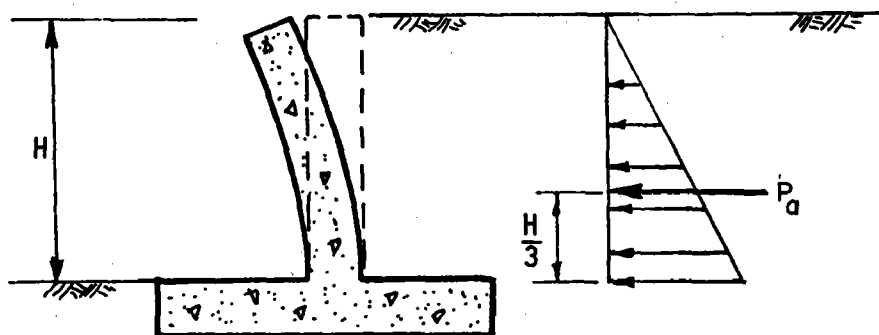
PRESSURE DIAGRAM: WALL ROTATING ABOUT BASE
